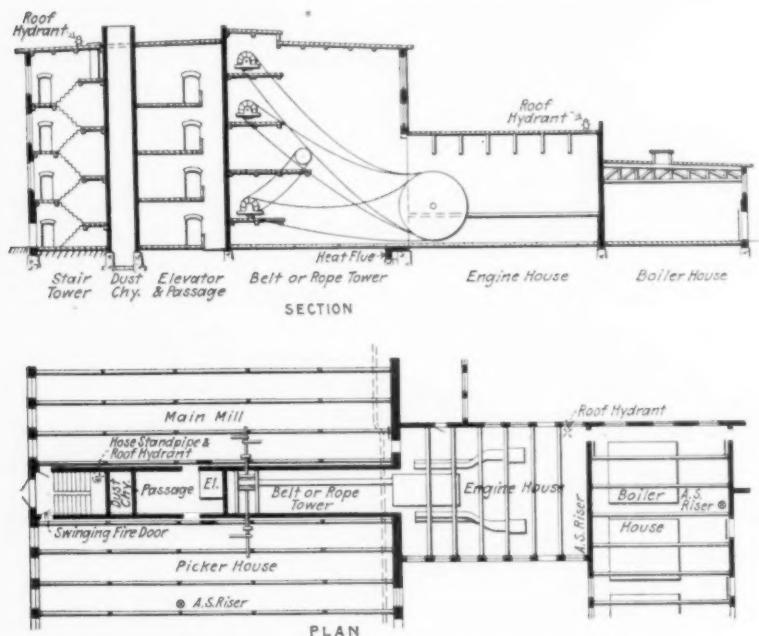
BELT, STAIRWAY AND ELEVATOR TOWERS
